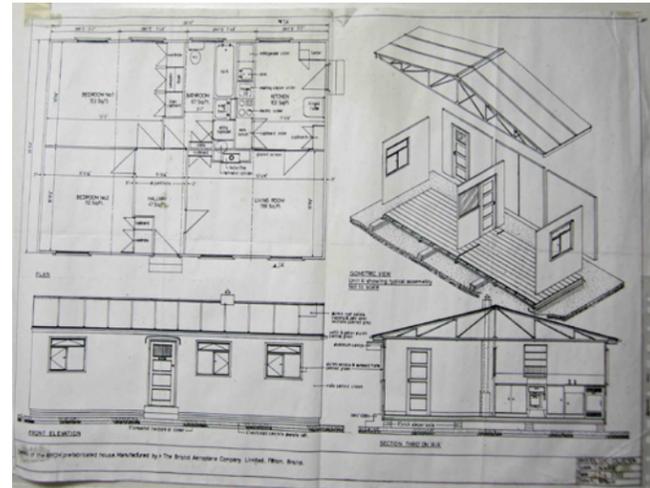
AIROH HOUSE CONSTRUCTION DRAWINGS. POTTER, B.
